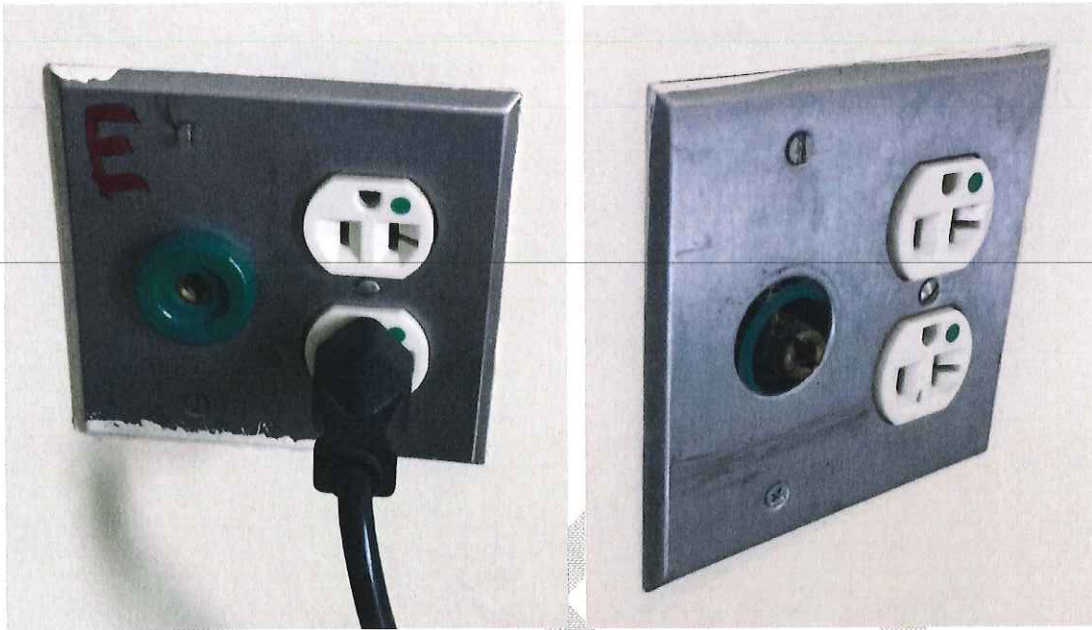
& 21: Resident room receptacles; Red "E" for Emergency, Damaged ground jack.
